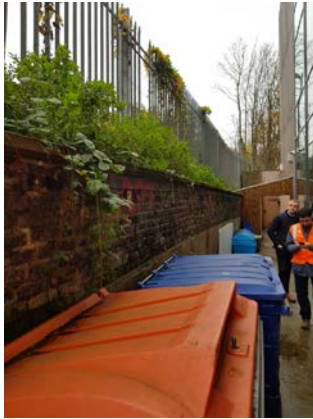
Chainage 690m looking east from behind Notting Hill Preparatory School. Showing the brick retaining wall with a balustrade fence that could be potentially removed to create site access from Portobello Road. Taken during site visit on 28 November 2019.
